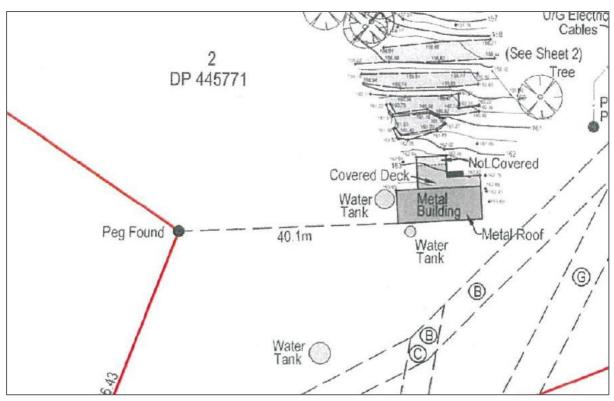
Part survey plan showing 40.1m distance from building to closest boundary point.
